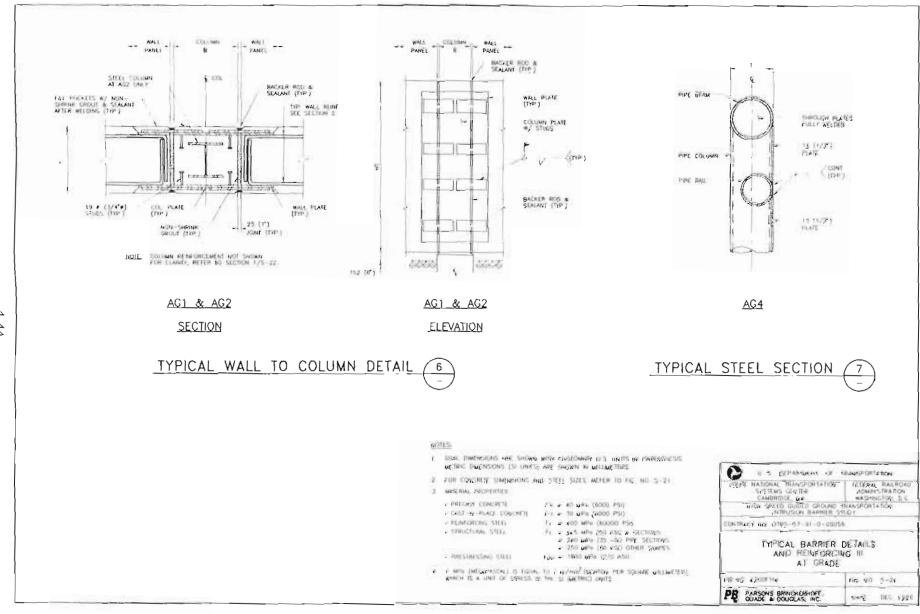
TYPICAL BARRIER DETAILS AND REINFORCING AT GRADE (III)
